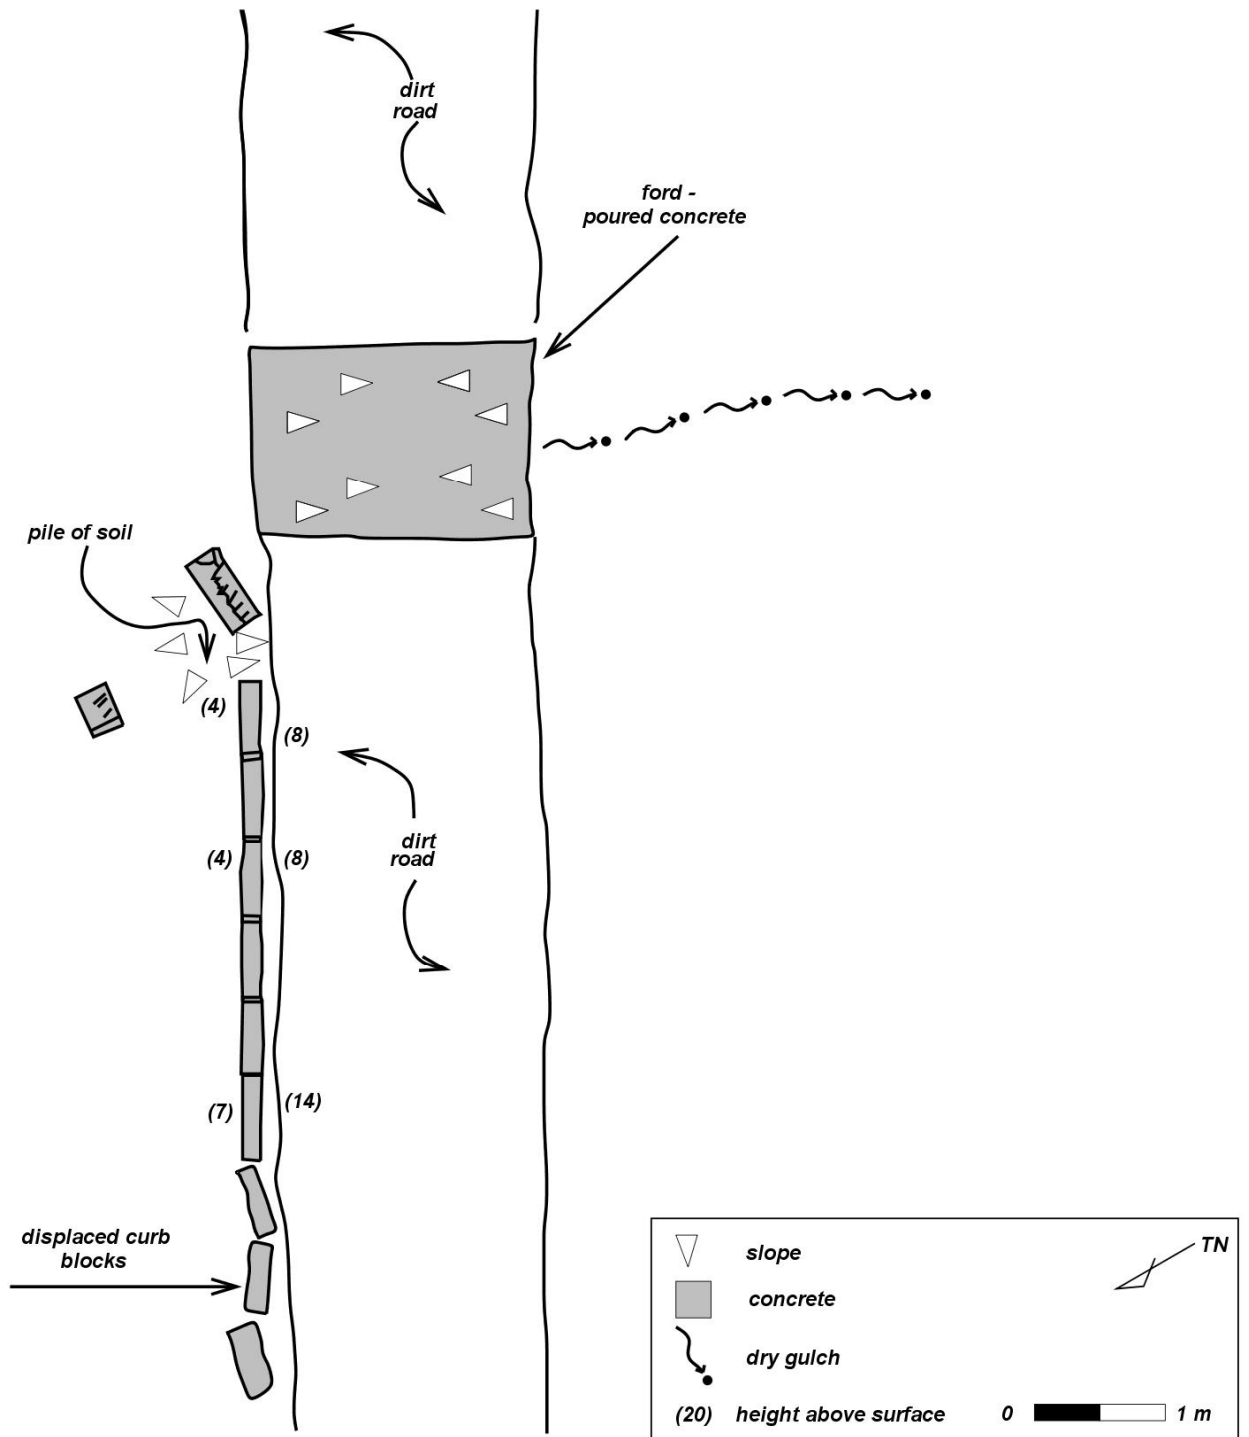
SIHP 50-60-01-02585 concrete curb and western culvert, plan view drawing.
